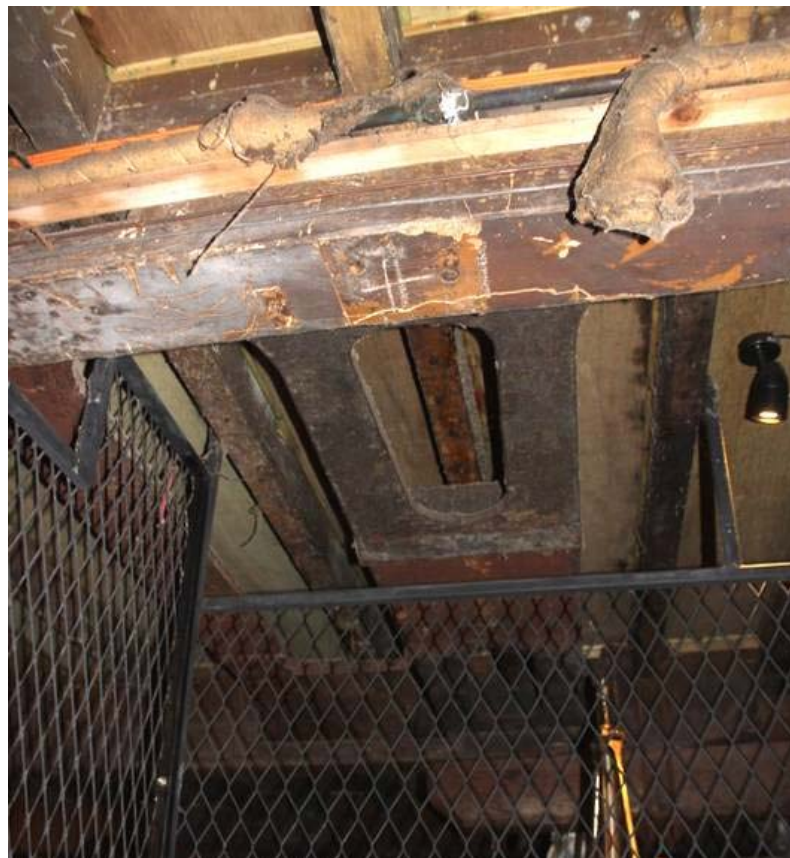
A large cast-iron bracket in the ceiling would have accommodated an upright shaft to take power to the ground floor
